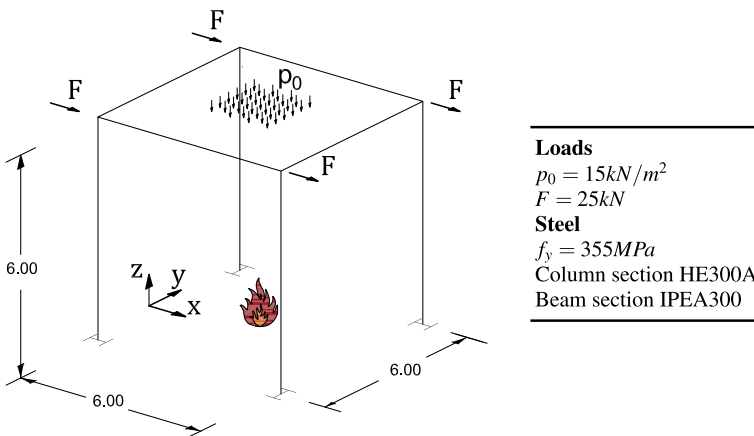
Simple steel frame: geometry, loads and cross-sections
